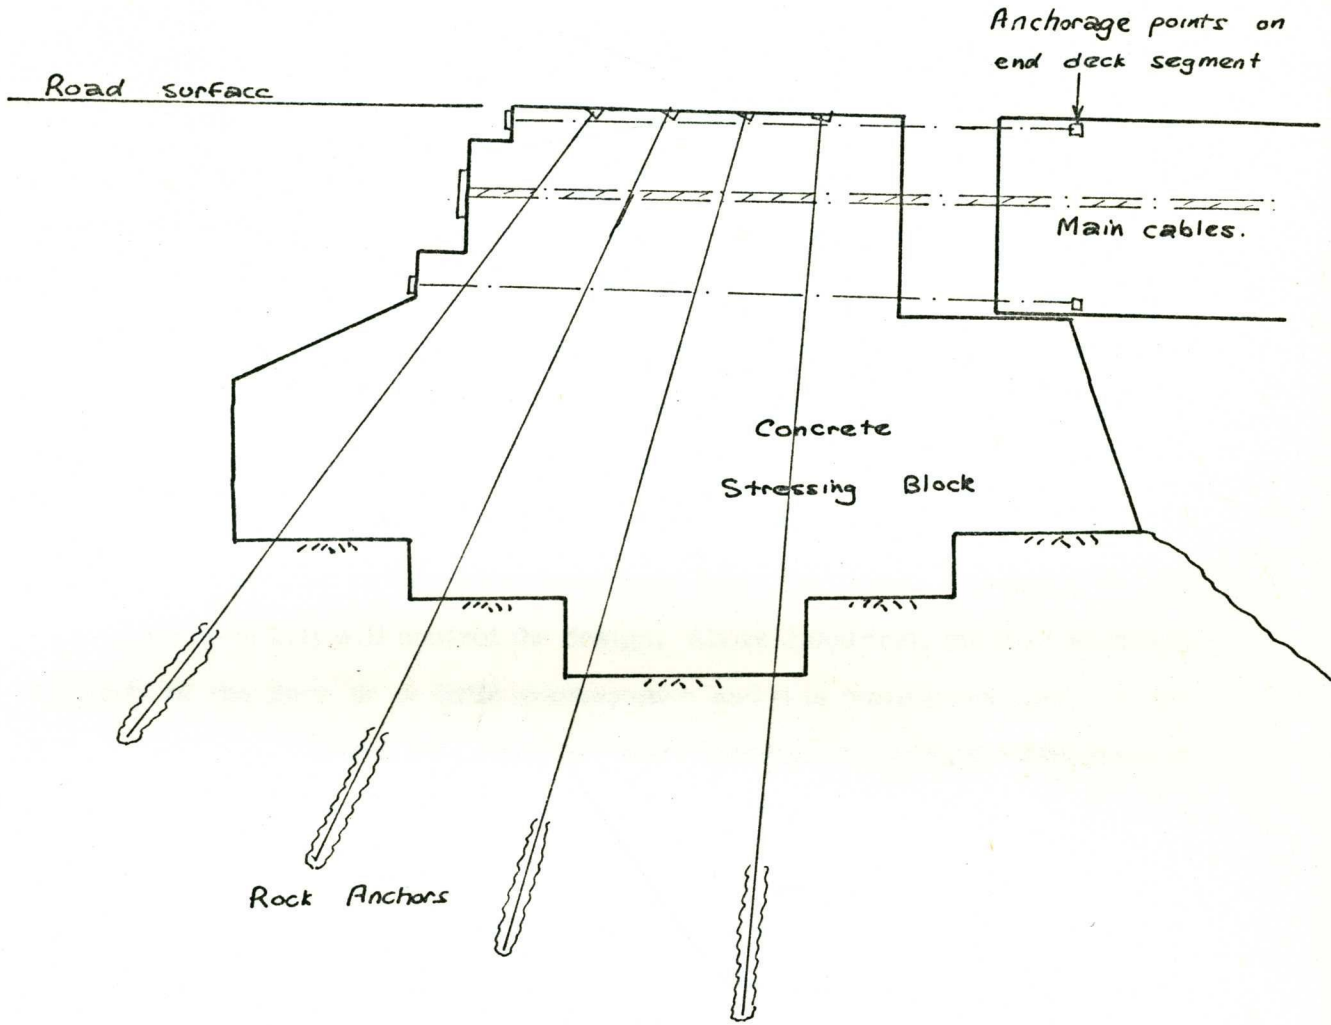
PROPOSED ANCHORAGE ARRANGEMENT
